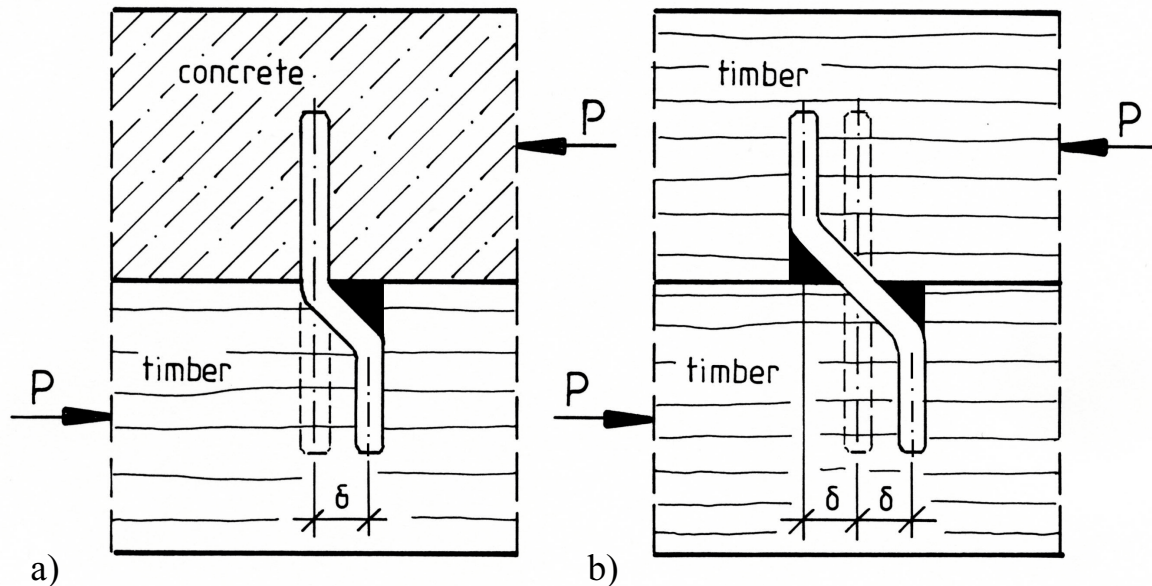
, b: Shape of deformed dowel type fasteners in a concrete-timber (a) and a pure timber-timber joint (b)
